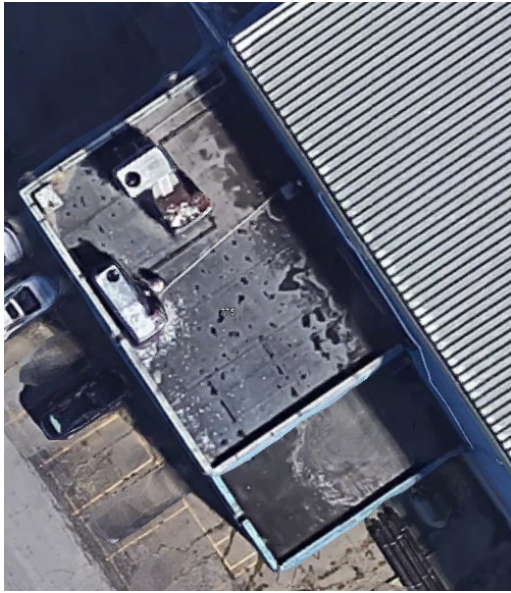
Aerial image of the Office roof. Existing roof appears to be a built-up asphalt roof. Areas of asphalt blistering and pooling is observed.
